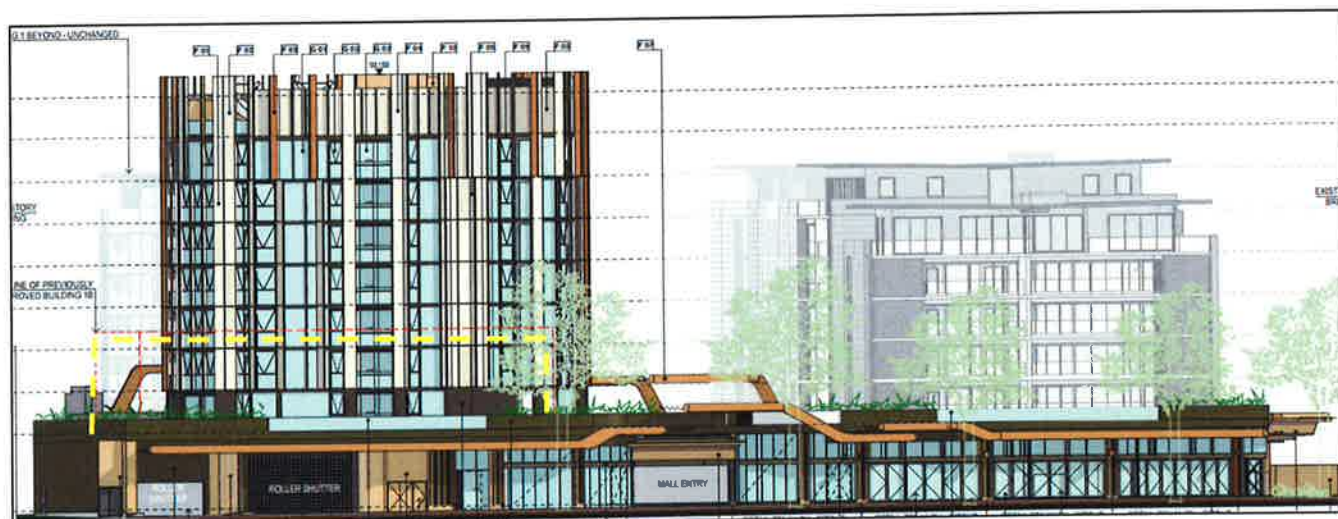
Proposed Evans Avenue elevation. Approved Building 1B envelope outlined in yellow (source: Proponent's request documents)
